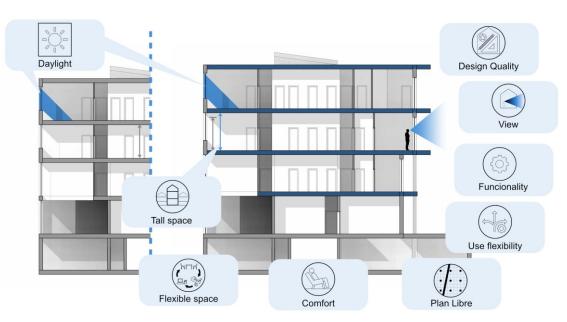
Building Lab Design Episode Room & Ceiling Height
